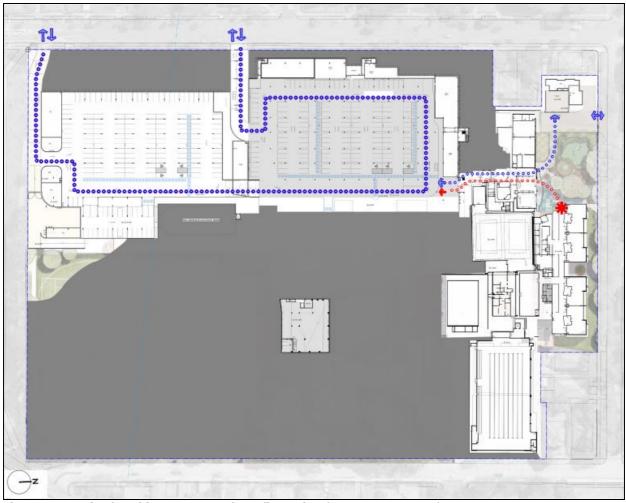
Revised Parking Layout and Configuration (Source: PMDL, 2020)
